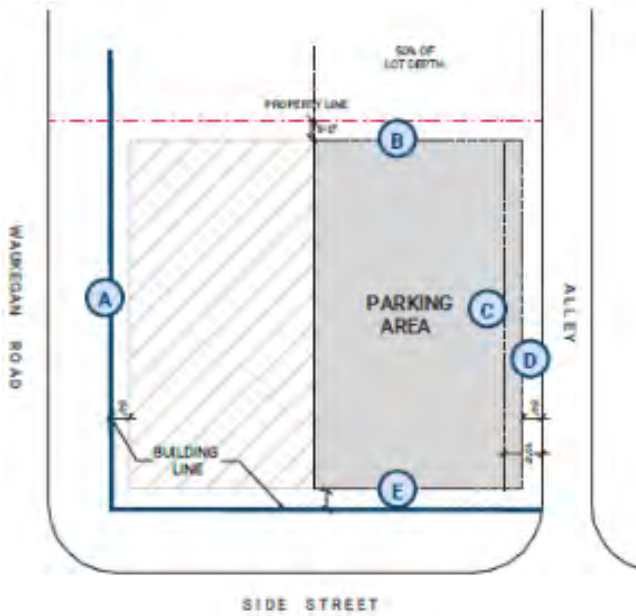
Waukegan Rd. - Residential Surface Parking Placement, Retail/Mixed-Use less than 30,000 SF
